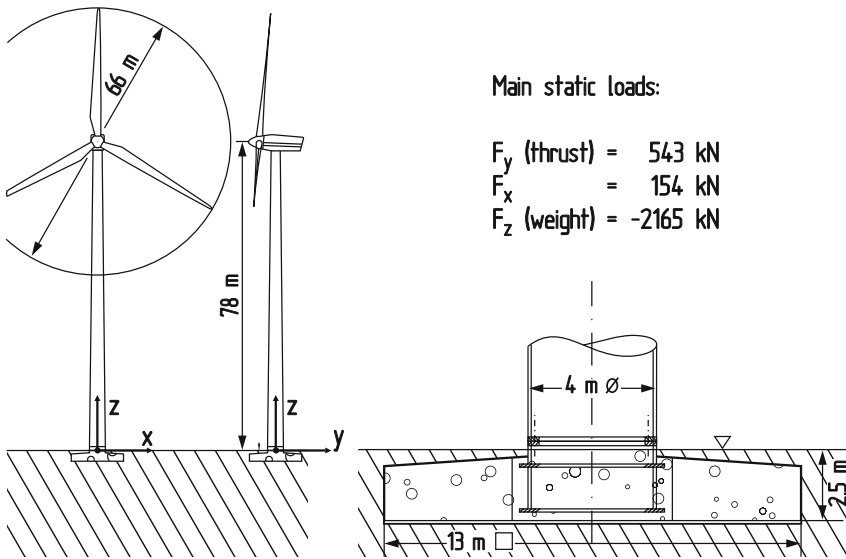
Dimension-determining loads and dimensions of the foundation of a large wind turbine (Vestas V-66 as an example)
